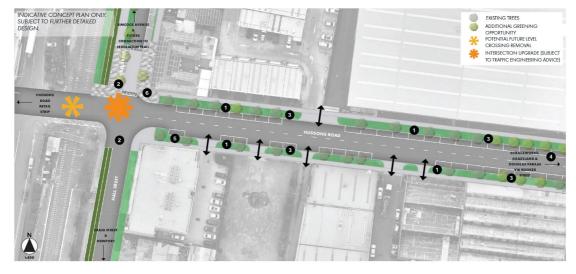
Hudsons Road East Indicative Concept from *Draft Spotswood Activity Centre Structure Plan, March 2022
